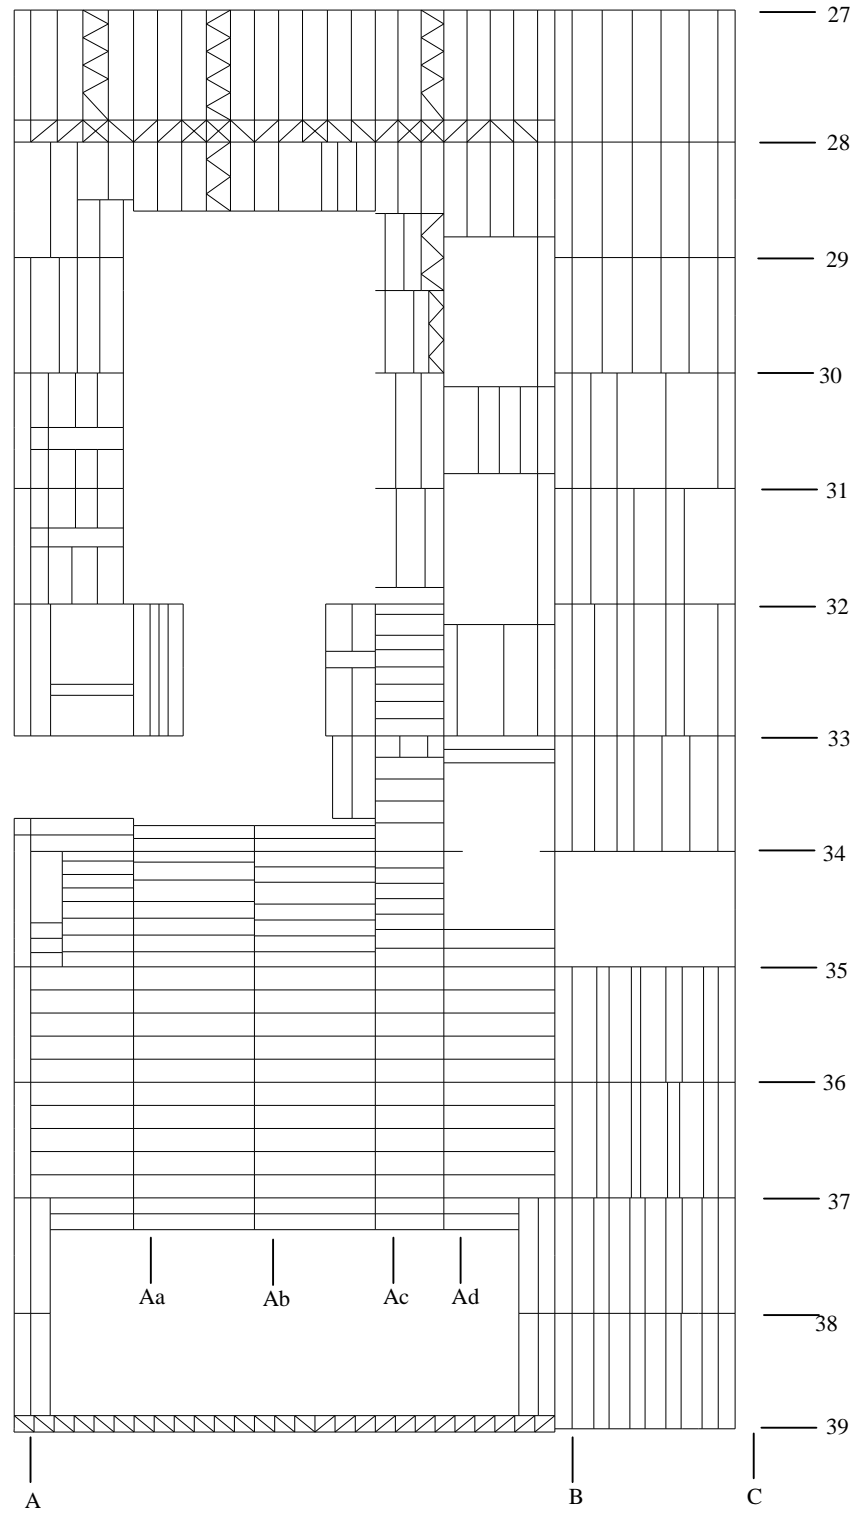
Mezzanine Floor Plan (8.5m level)
